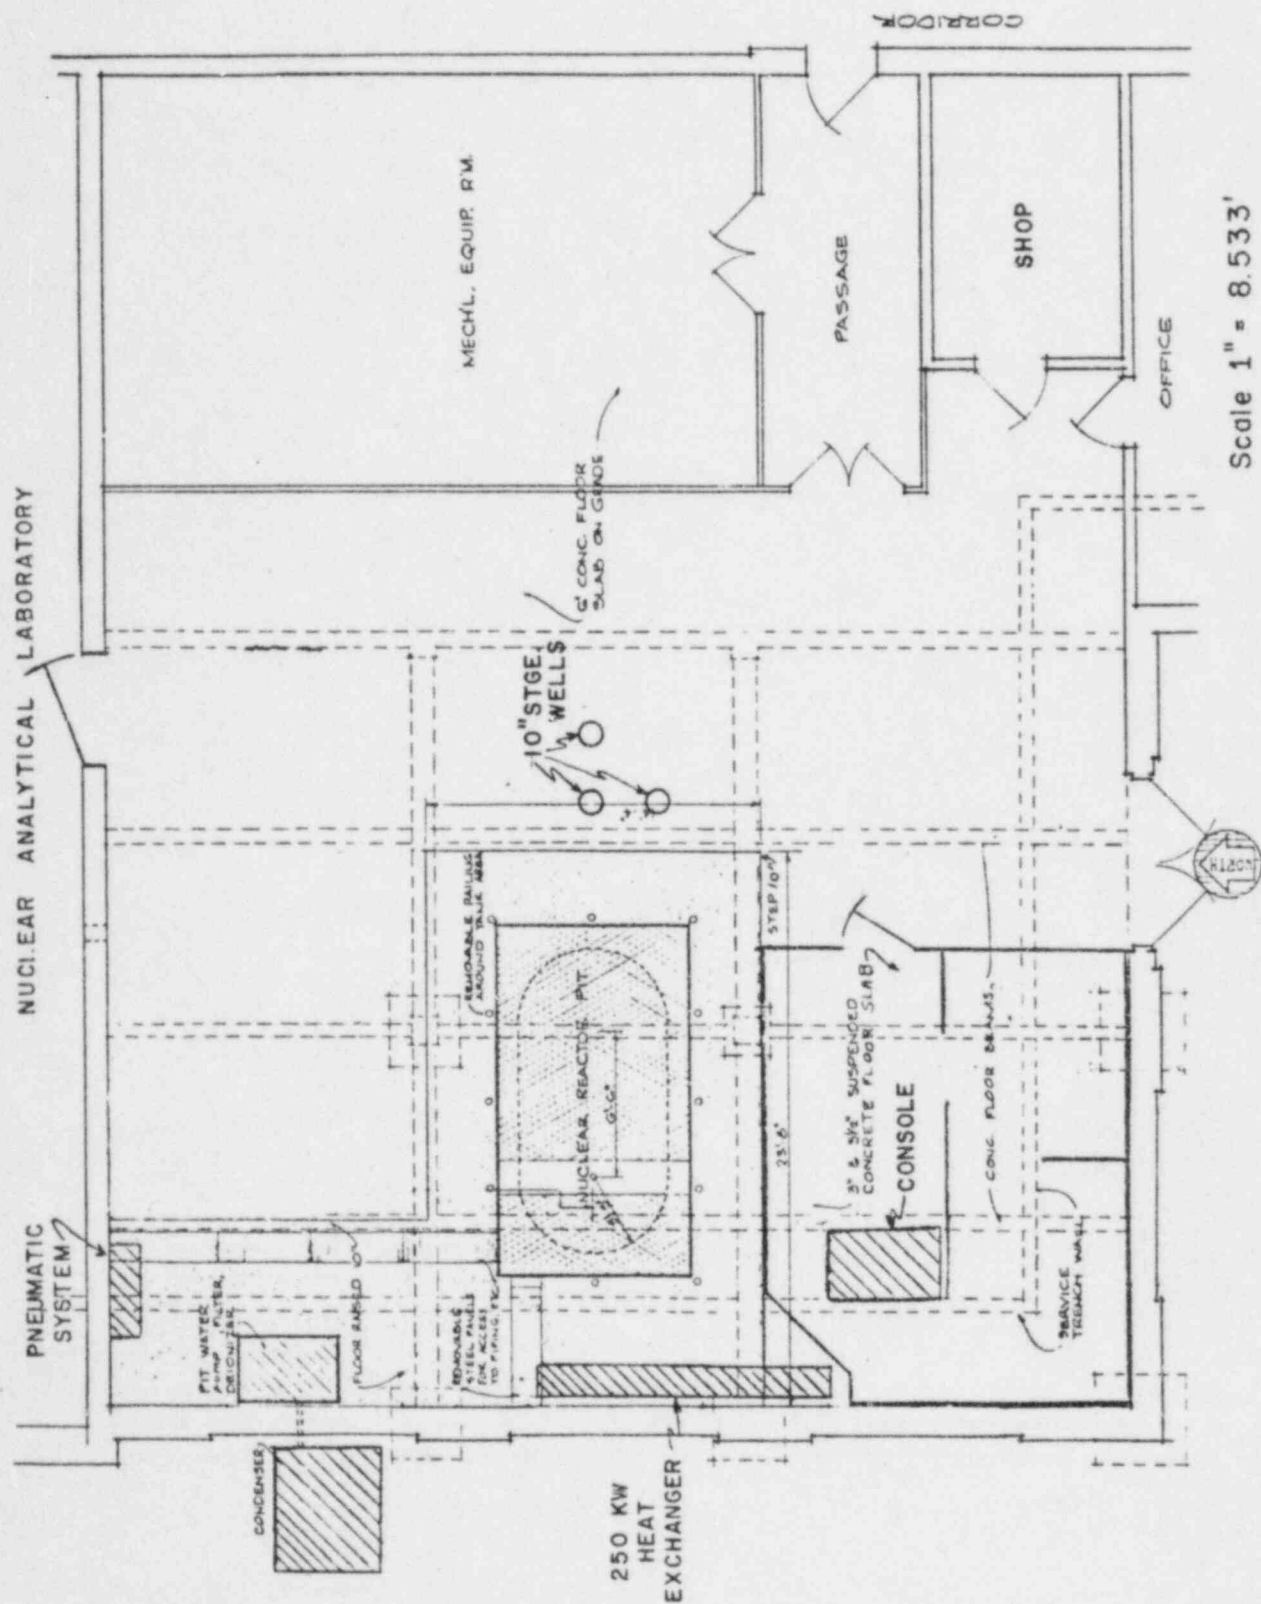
TAYLOR HALL 131 FLOOR PLAN
